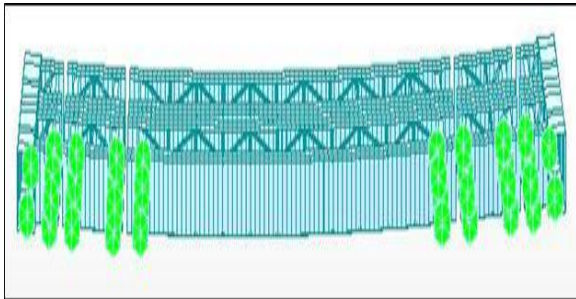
Stage 1- Elevation (Segments simply supported on temporary supports)
